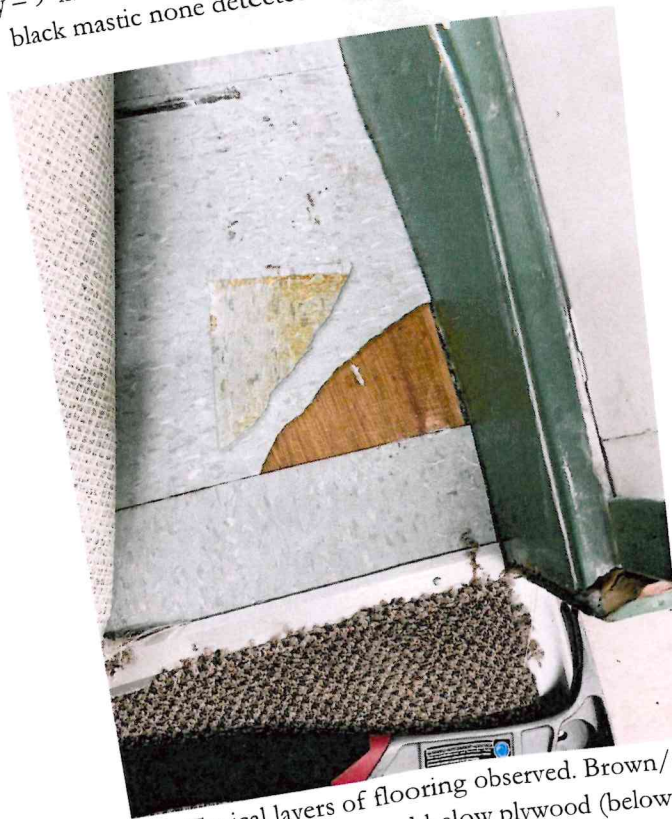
3rd Floor Room 18 – Typical layers of flooring observed. Brown/tan 9"x9" vinyl floor tile and associated black mastic identified as ACM located below plywood (below blue floor tile and carpet).
